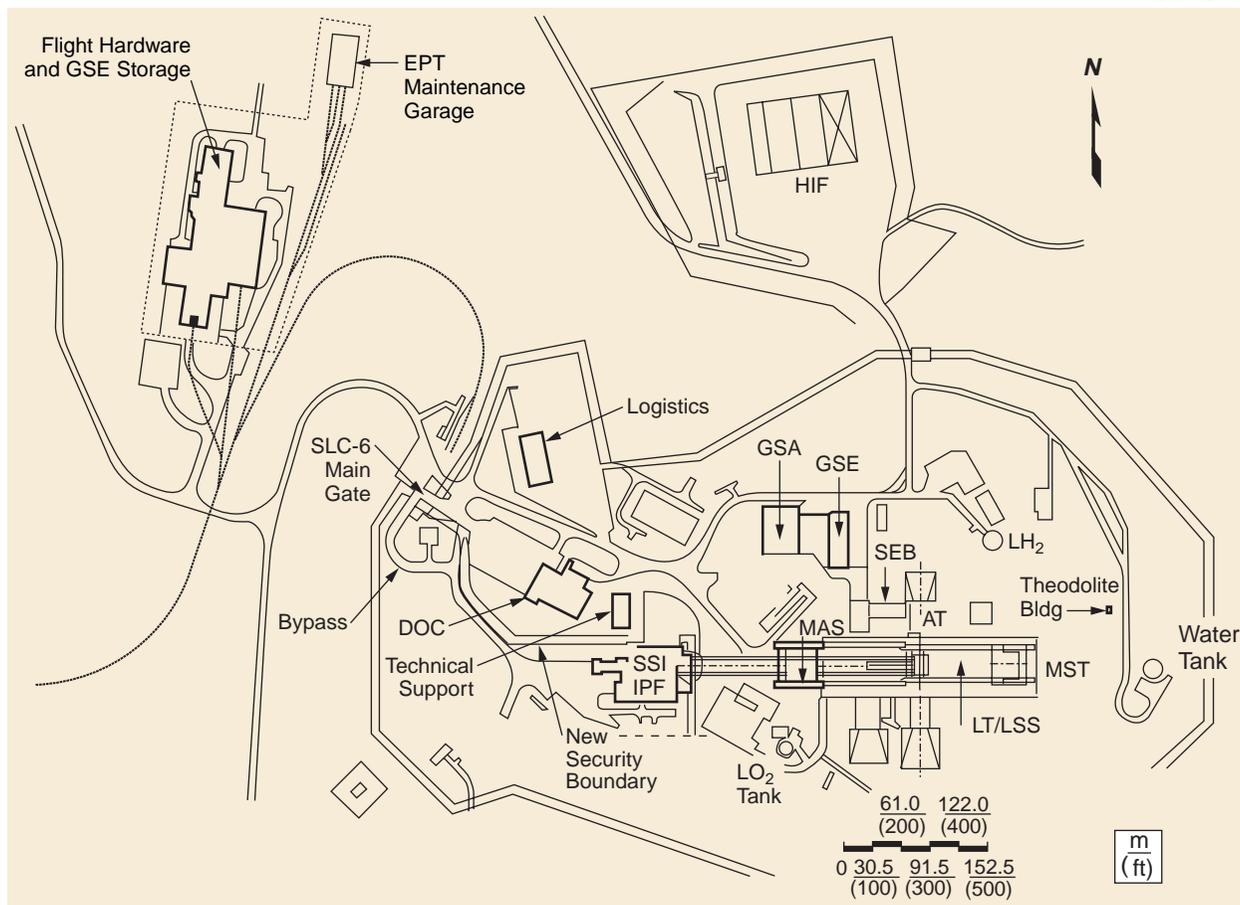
Space Launch Complex 6, VAFB Site Plan
